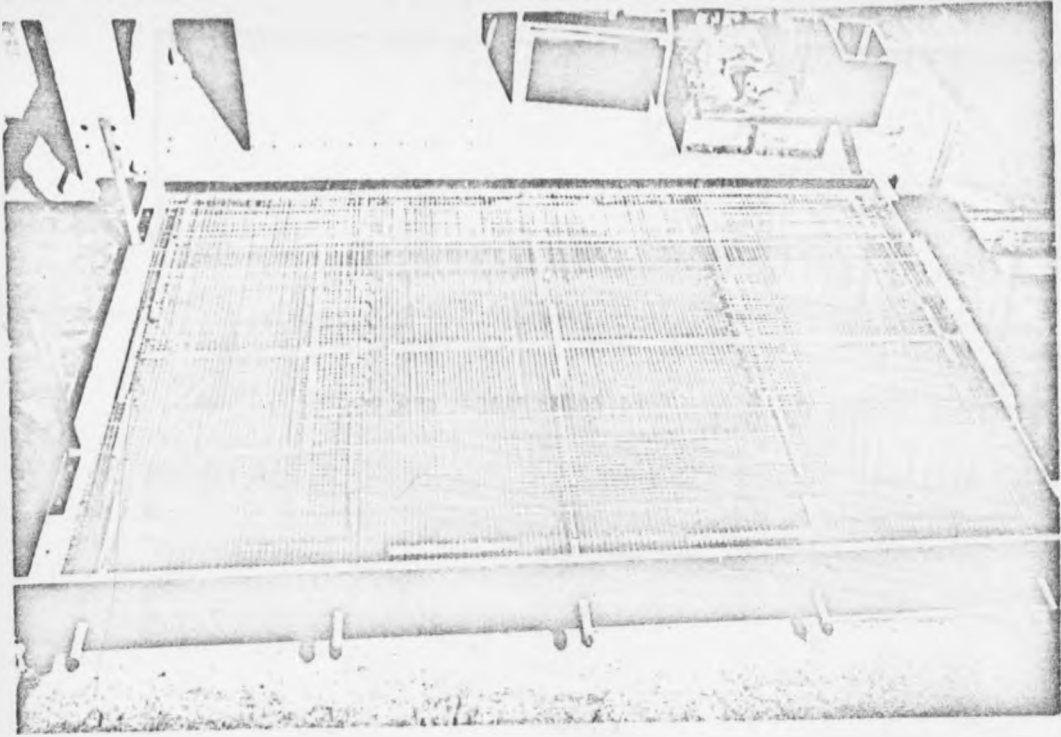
REINFORCEMENT IN BASE - GENERAL ARRANGEMENT
